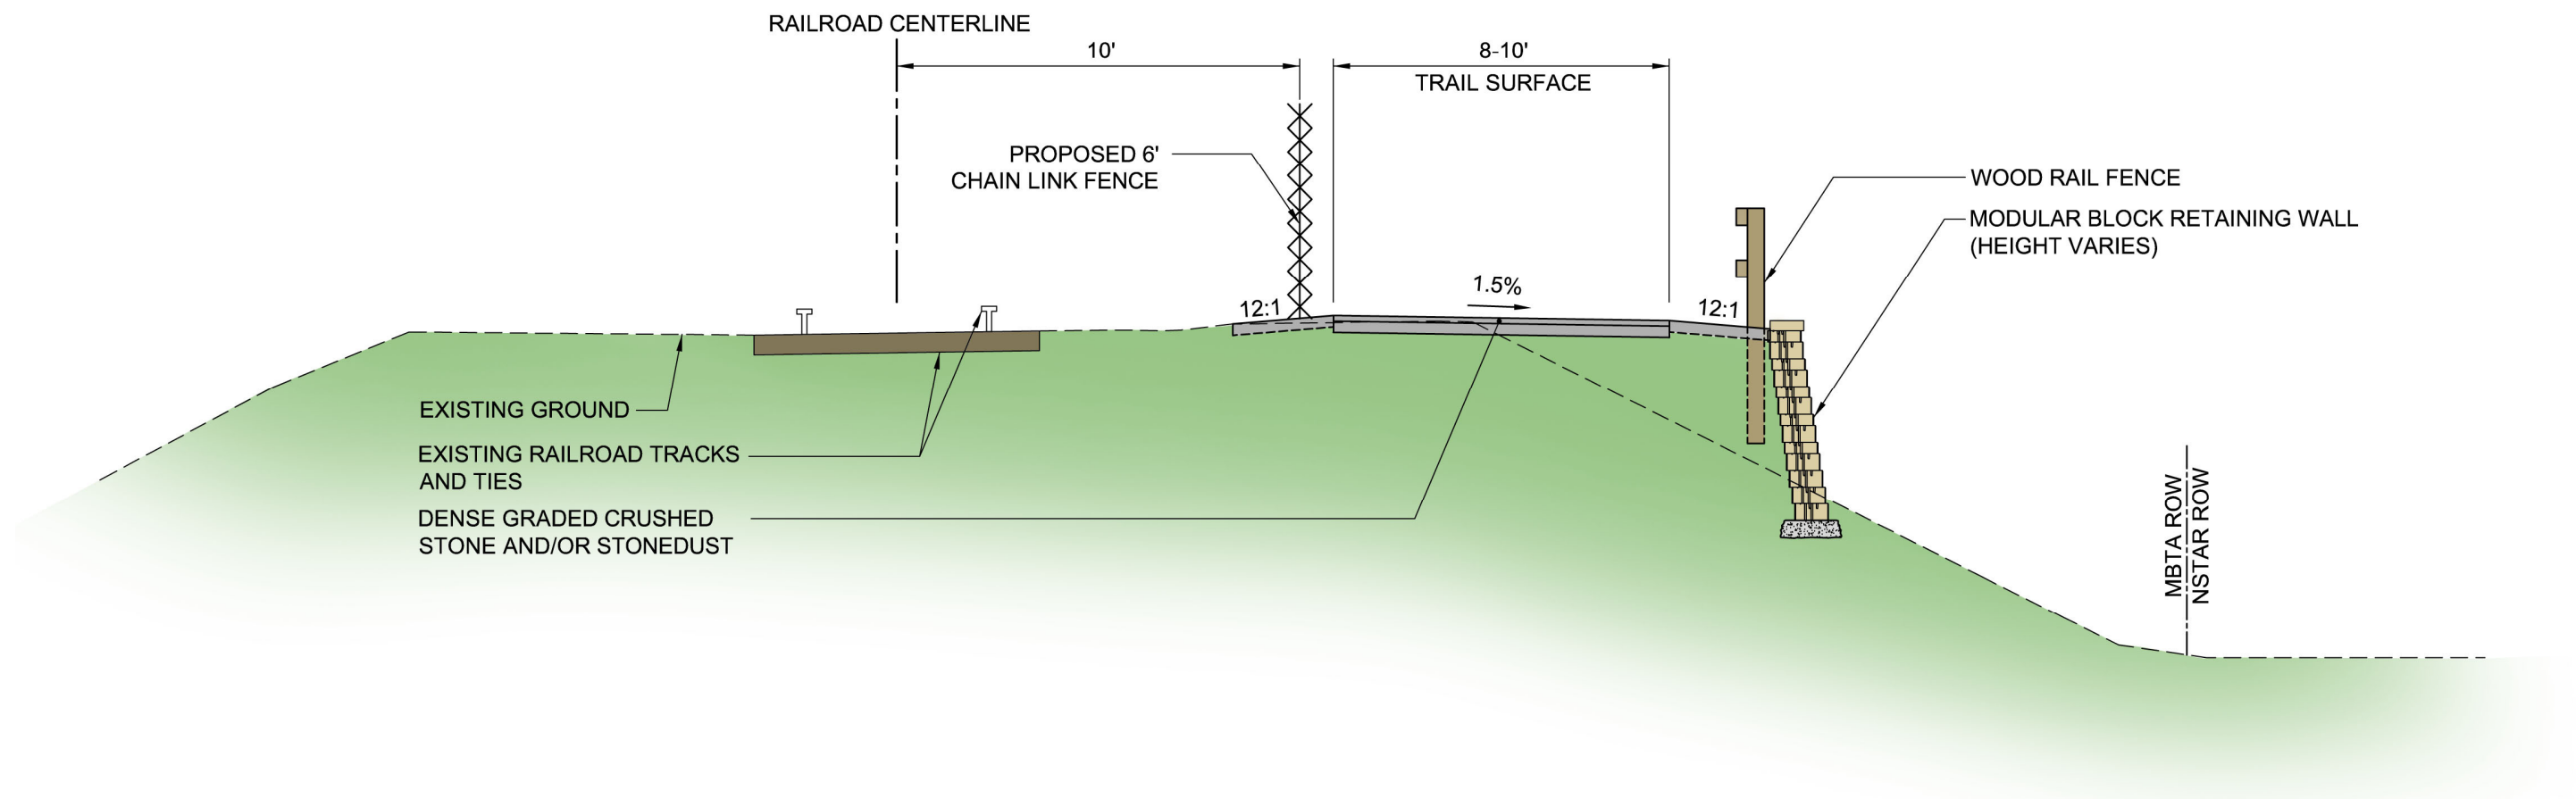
B: Alternative 1 – MBTA ROW Conceptual Typical Section
